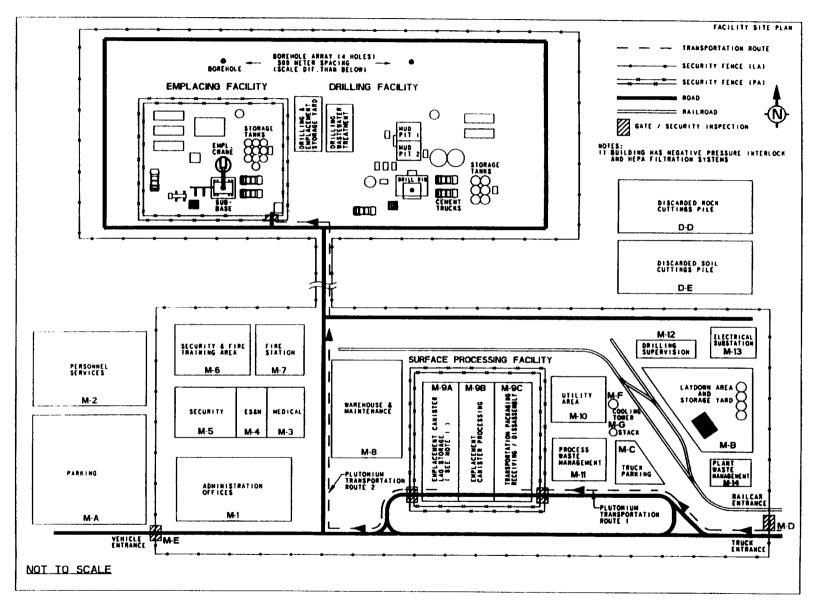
Deep Borehole Facility Site Plan Detail and Plutonium Transportation Routes
